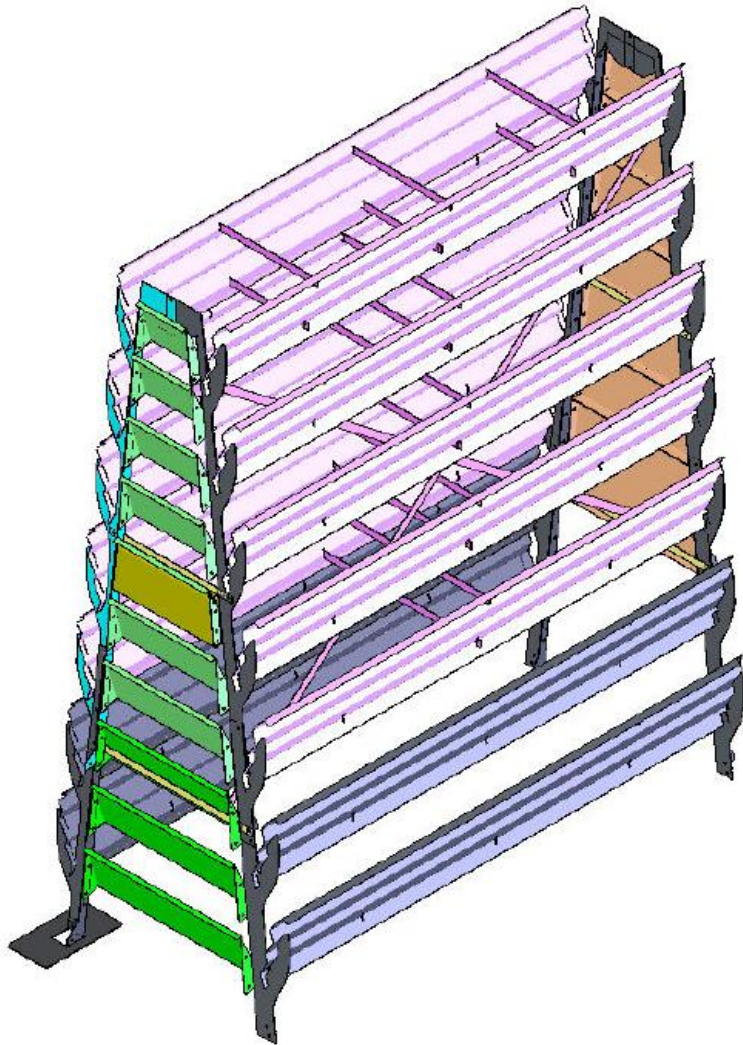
Noise barrier wall system Naturawall[®]: Isometry.
